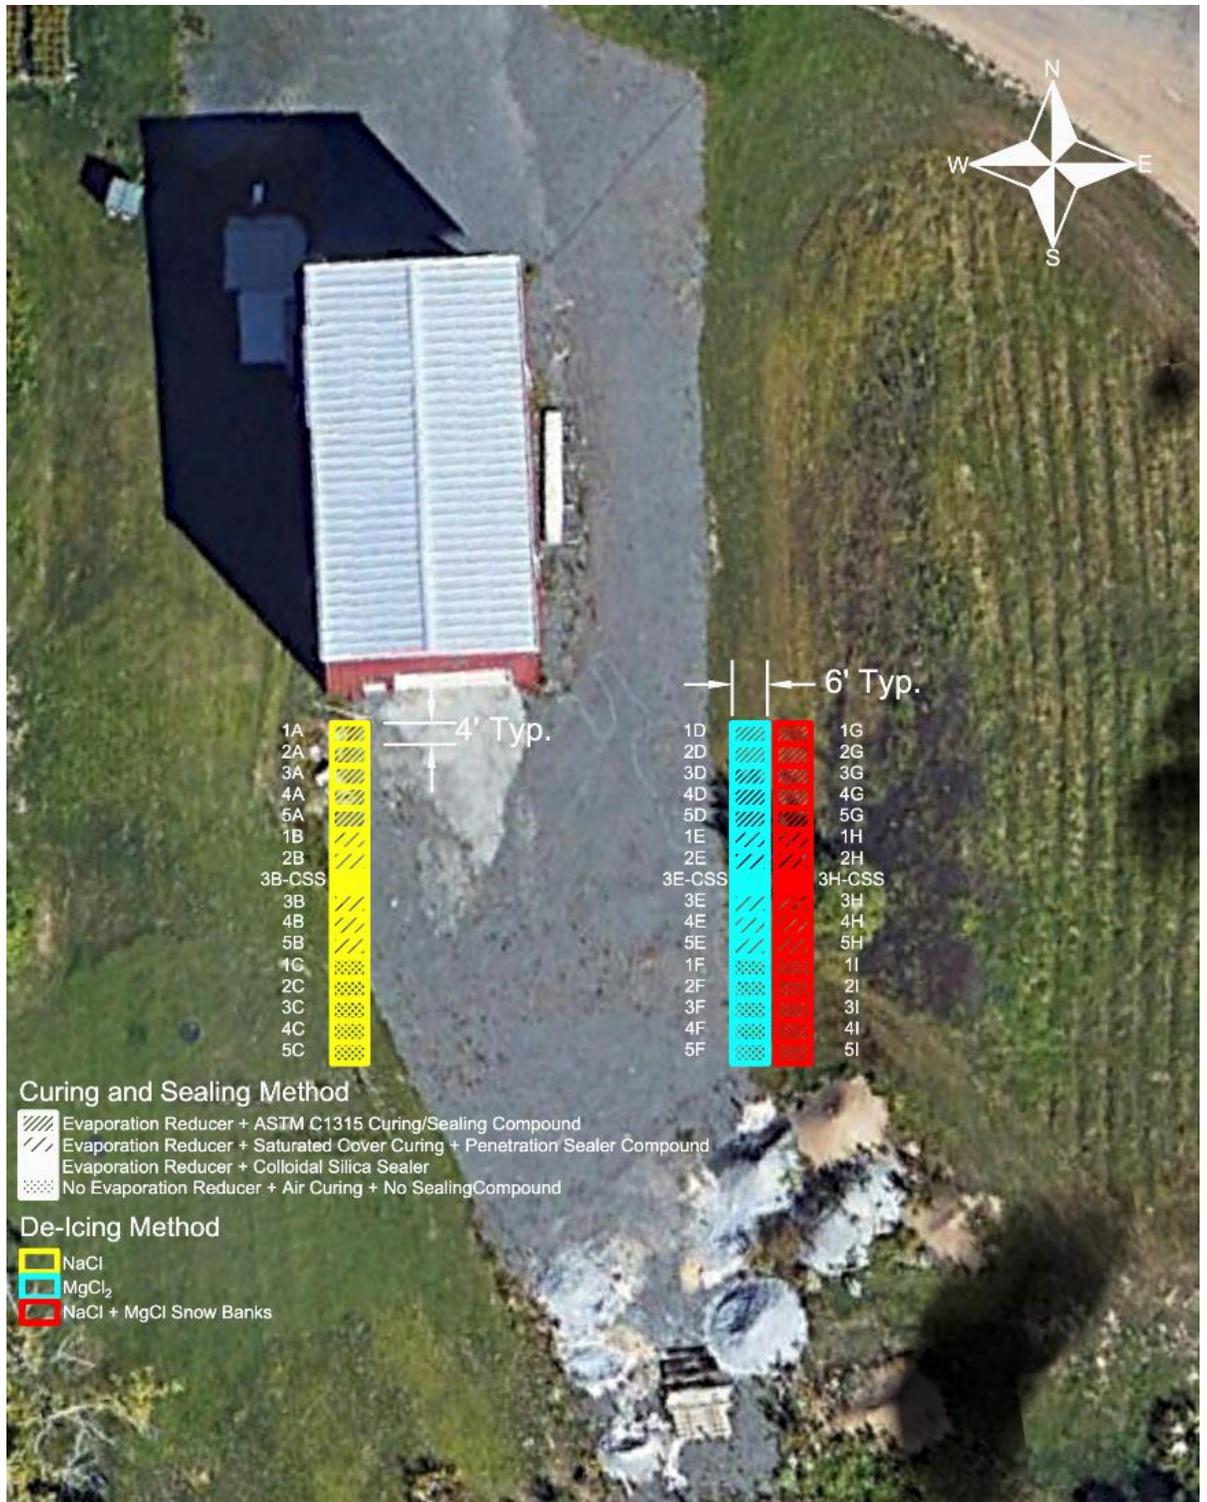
Layout of sidewalks on south side of Robert Brack Structural Testing Laboratory at UMass Amherst
